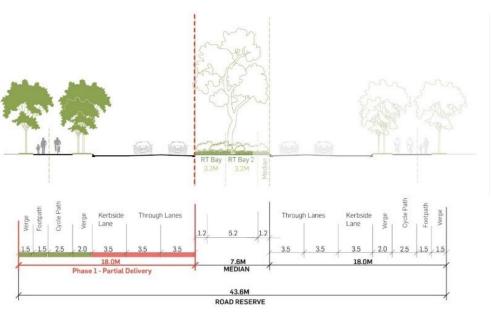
Draft Precinct Plan – Eastern Ring Road Sections DRAFT PRECINCT PLAN (60M)
